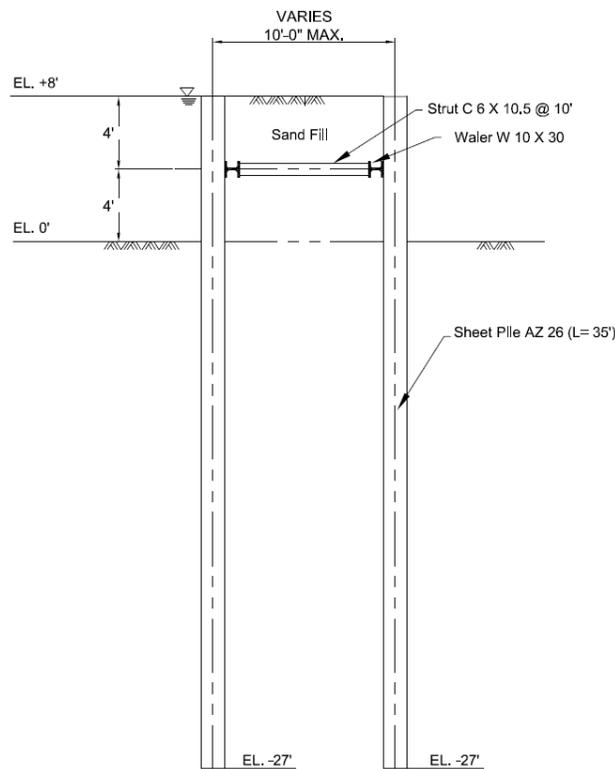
Cross-section of 8 ft Double Sheet Pile Wall for Soil Areas 4 to 7
